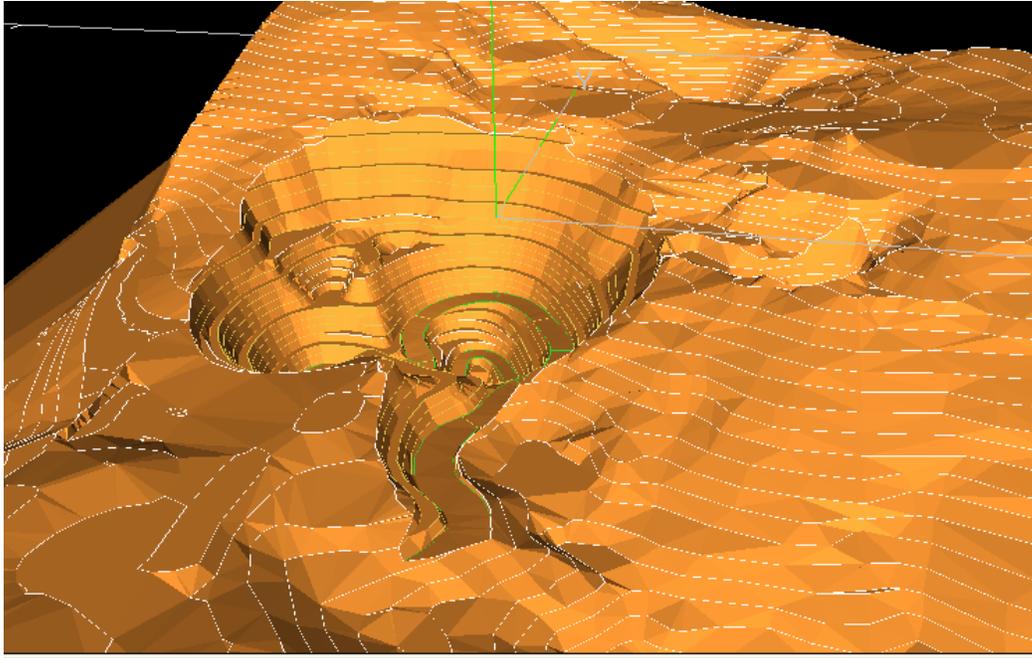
Open Pit Design Stage 2. View of design 4 – showing all cut ramp at pit exit
